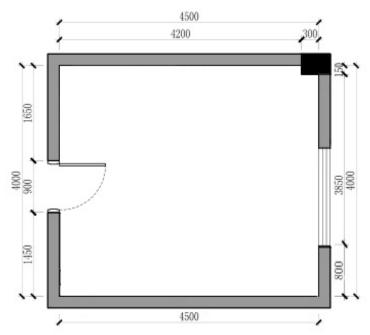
1 Space Floor Plan (zhihu.com, 2019)
